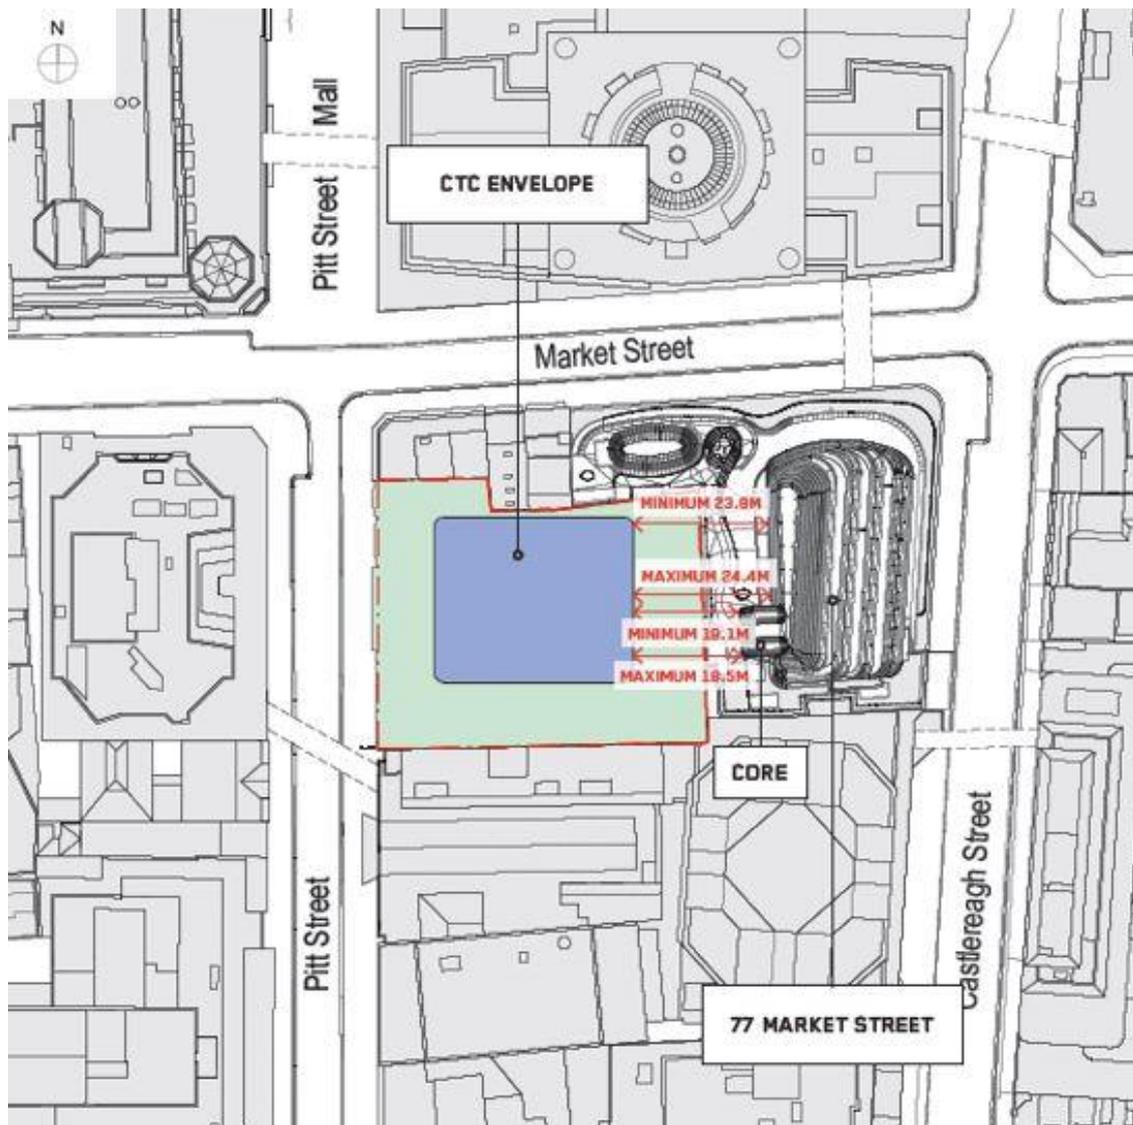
Site plan extract demonstrating separation distances between the proposed tower (in blue) and the approved development at 65-77 Market St
